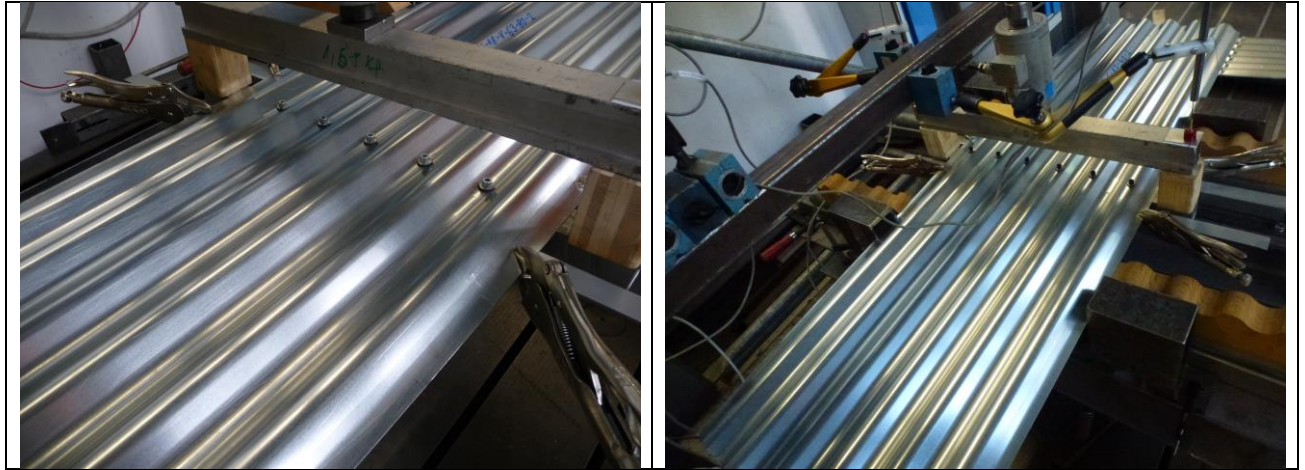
Picture of the test setup internal support tests for uplift loading (fastening in the valley or crest)
